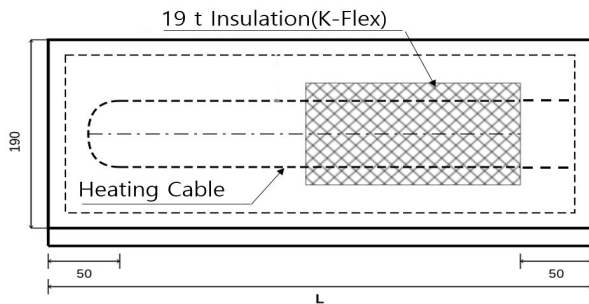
Under deck heating cable detail (similar to Zone 4, initial design for Zone 5)
